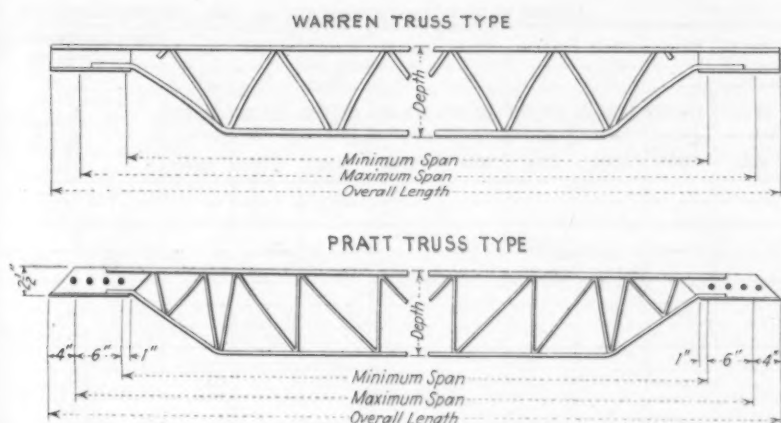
The design of the open-truss joist follows along the lines long used for built-up structural steel trusses.
